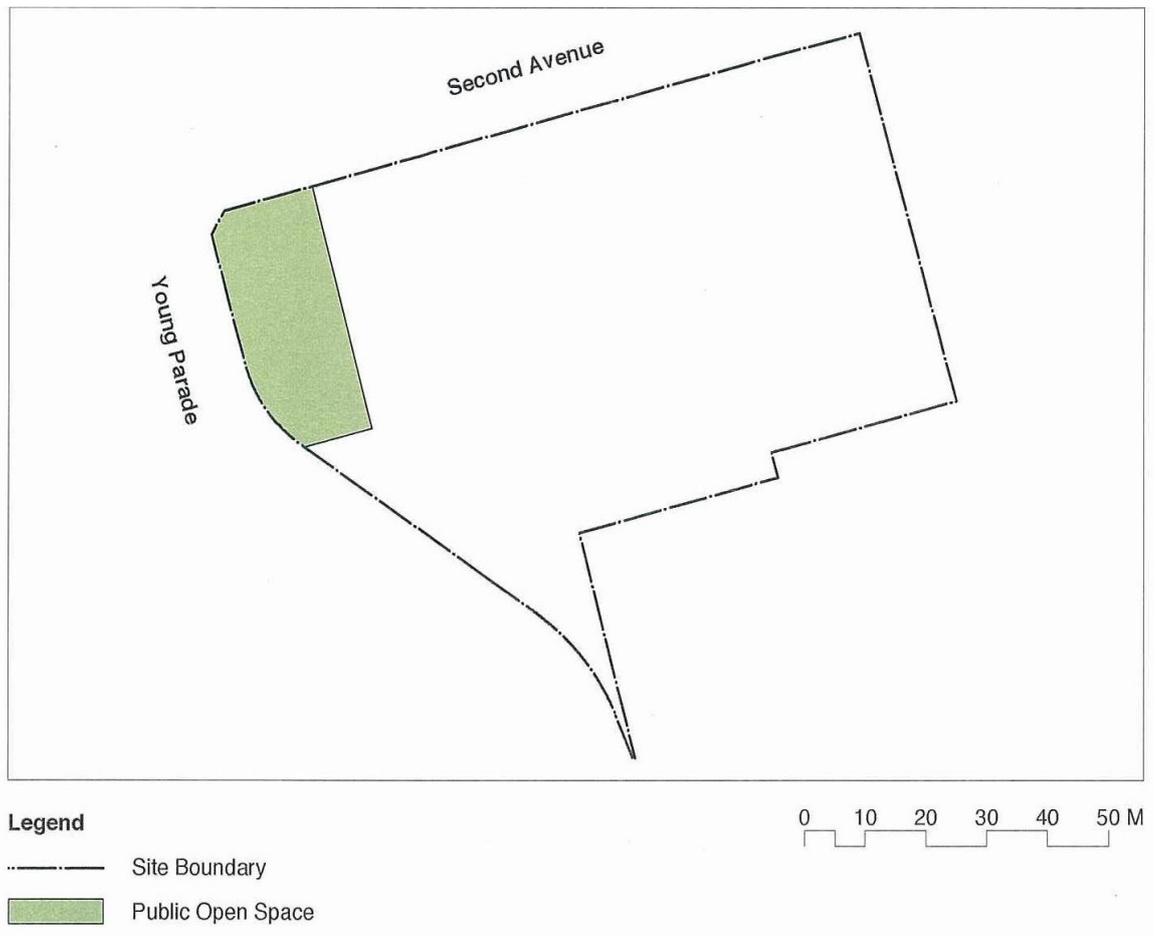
Location of Privately owned Publicly Accessible Open Space
